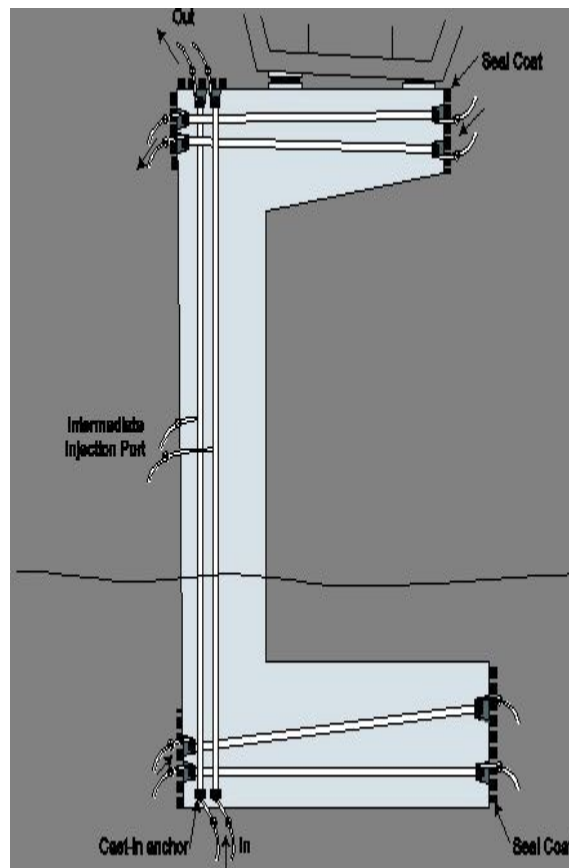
Grouting details details and anchor protection for vertical and lateral tendons in C-pier
